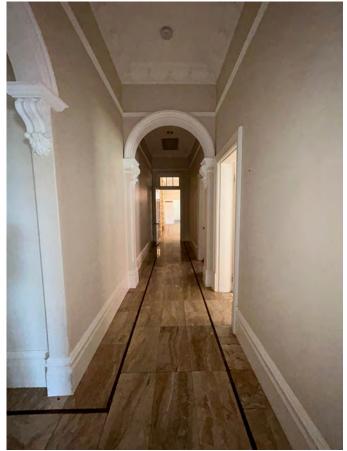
View west from eastern end of corridor towards Bathroom and Lounge Room, capturing both archways, timber skirting and stone tile flooring.(Source: PA 2023)
